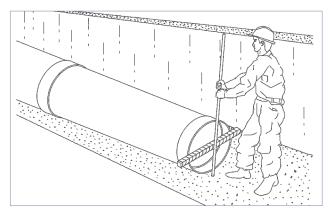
Mounting the coupler for DN ≤ 350 mm
